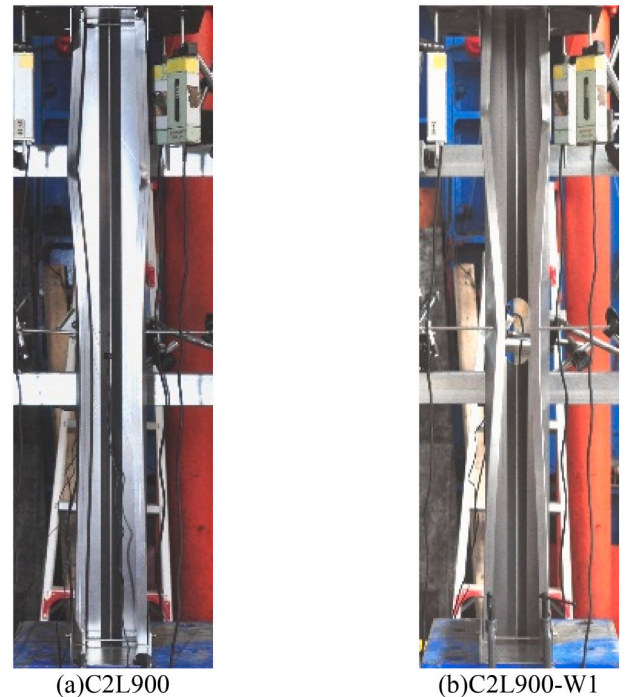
Failure modes for C2-section specimens with a length of 900 mm.
